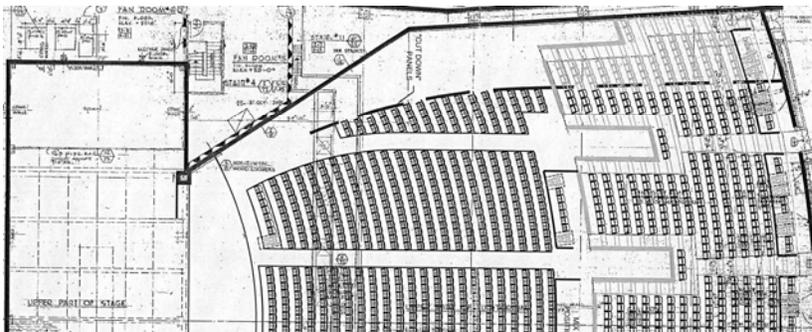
Half of floor plan, stage and seating area, Santa Monica Civic Auditorium
